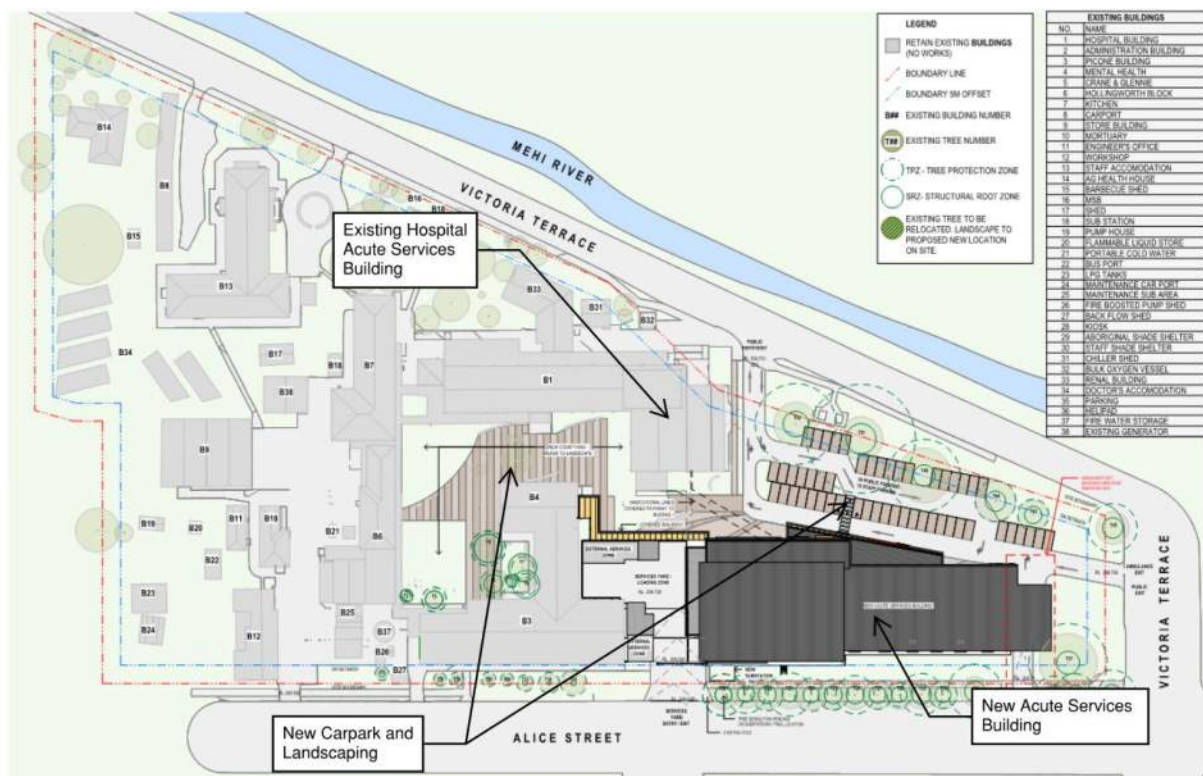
Proposed Site Plan (STH, REV F - 8/09/2023)
